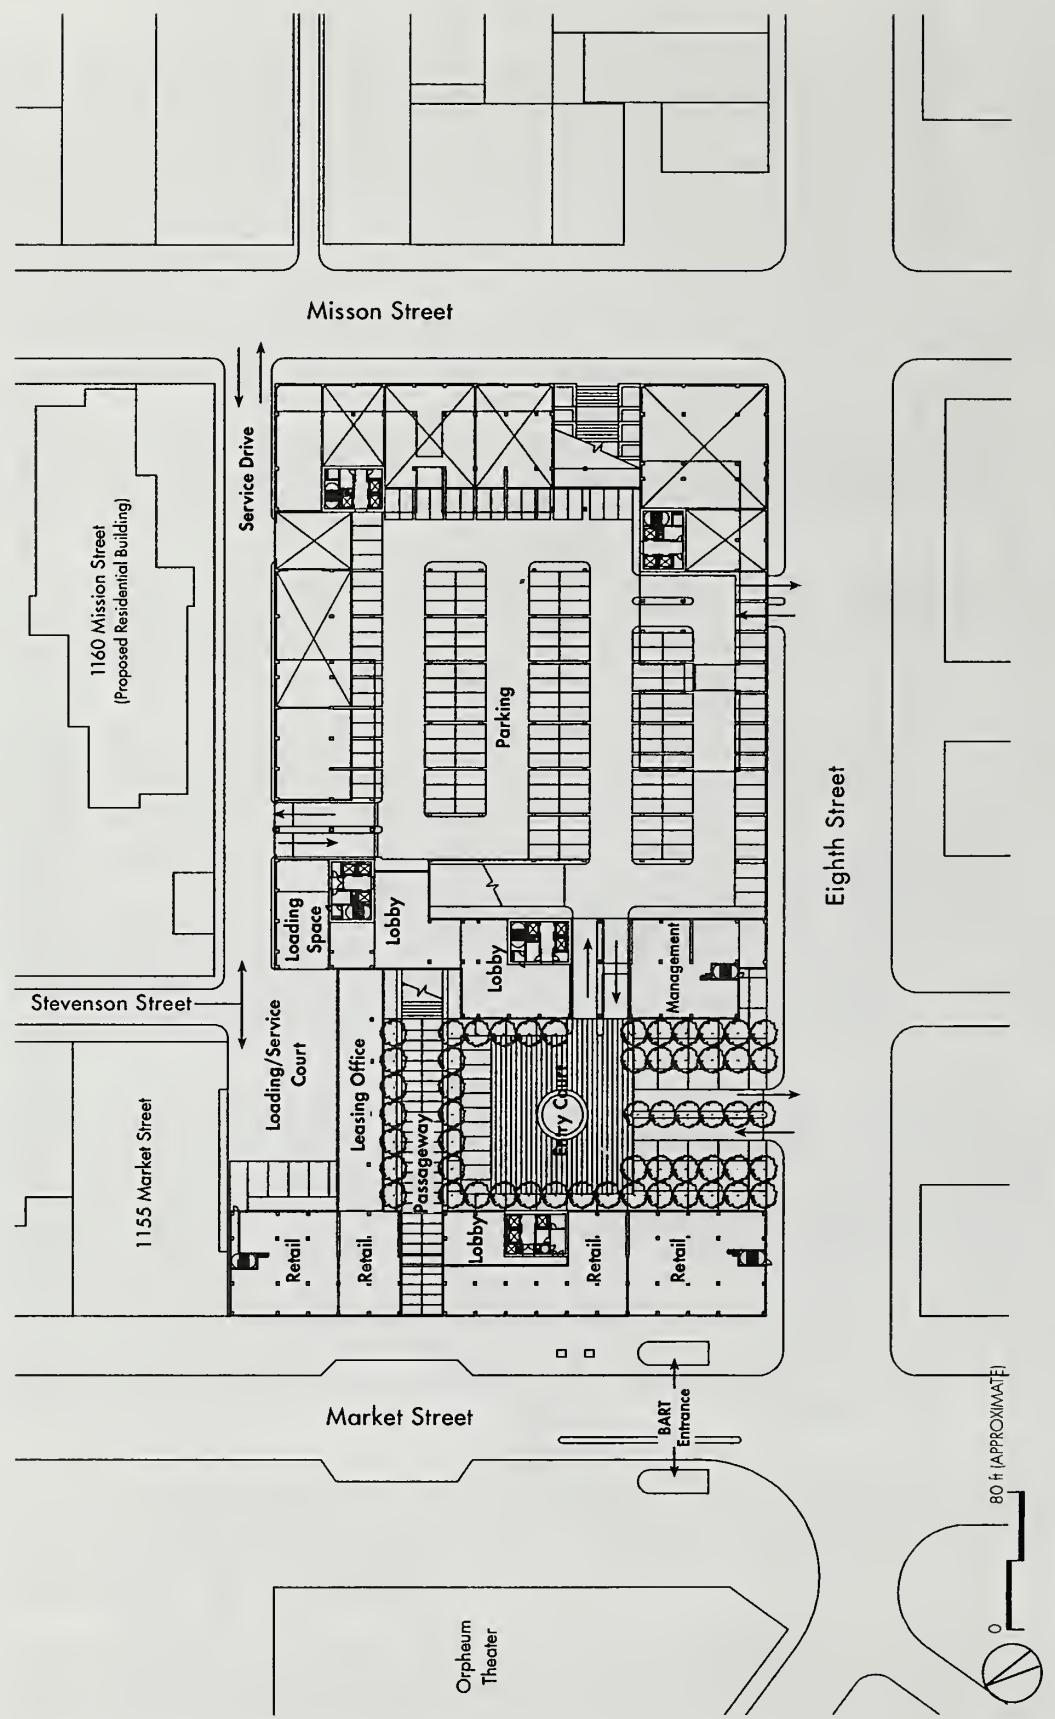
GROUND FLOOR PLAN (AT MARKET STREET GRADE)
